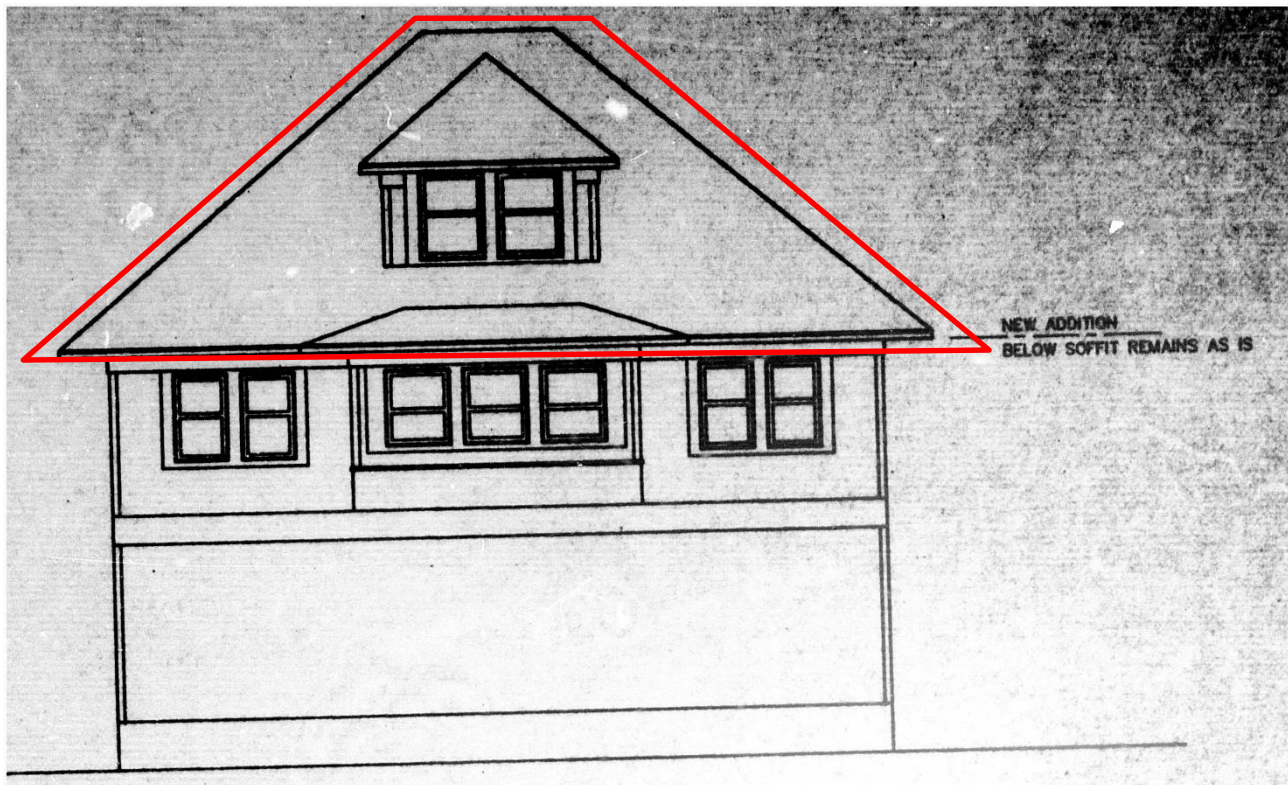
Plans from the 1992 building permit to add a half-storey with gables. The new addition is outlined in red.
